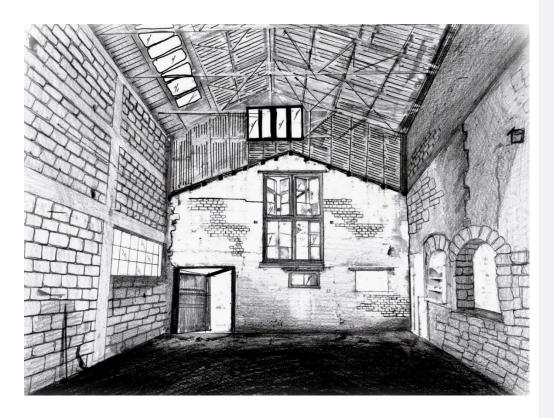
Preliminary hand sketches showing the 'patch-work' of construction styles.
